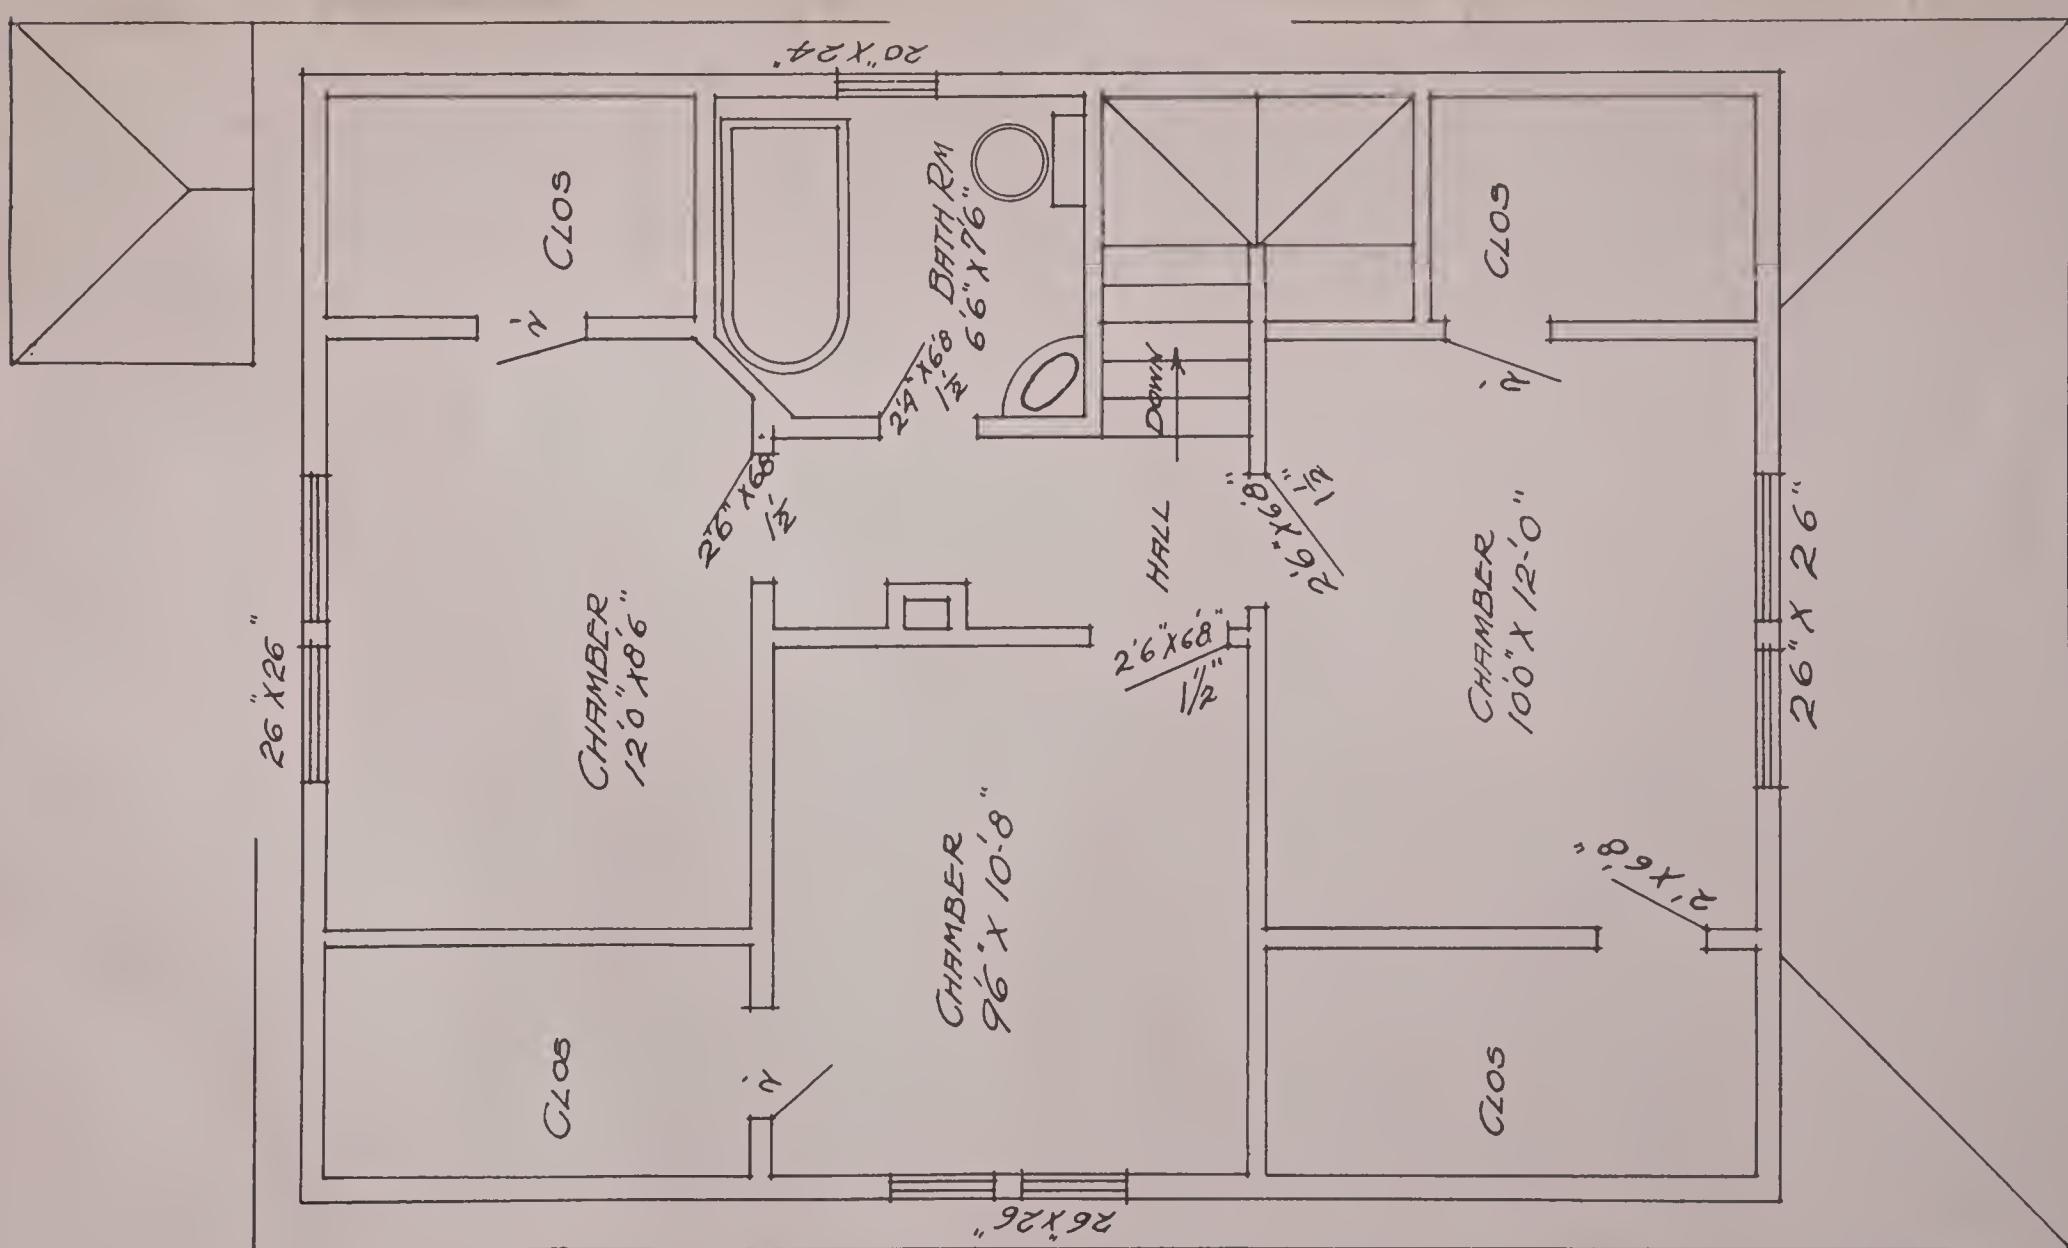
PLATE Ib.—Second floor plans of house erected by the Rockton Realty Company at Amsterdam, N. Y. Elevations shown in Plates I, II and III.
